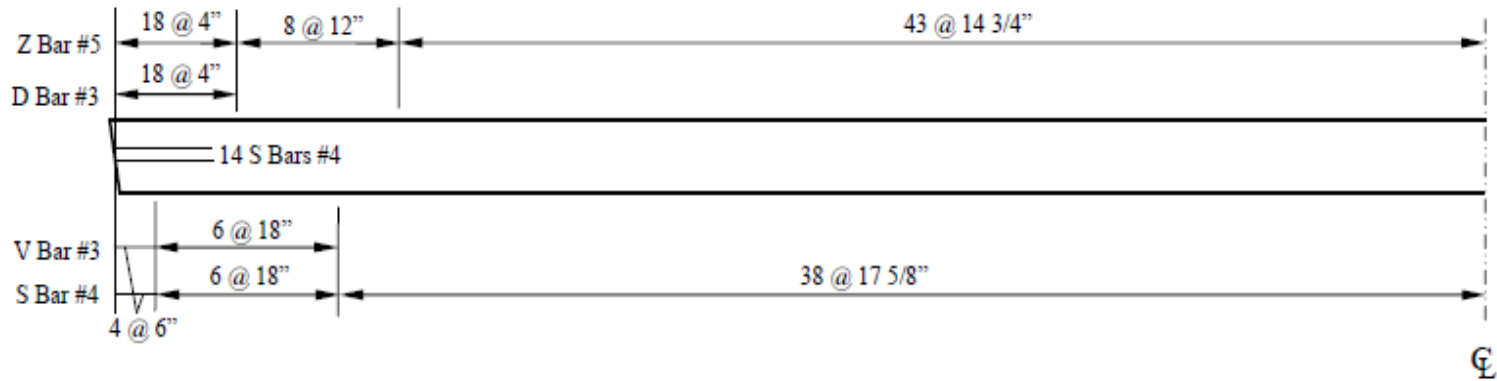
Mild steel reinforcement in BT-72 girder.
